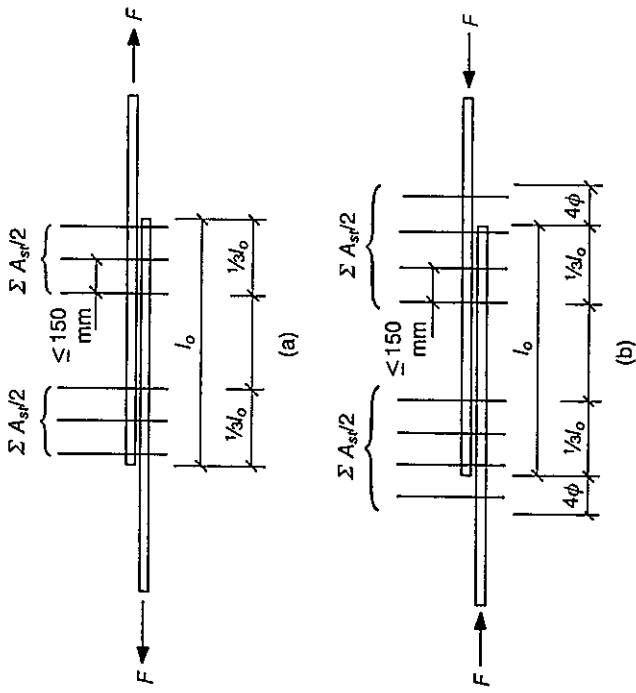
Detailing rules and notation for lapped splices (plan view): (a) in tension; (b) in compression
